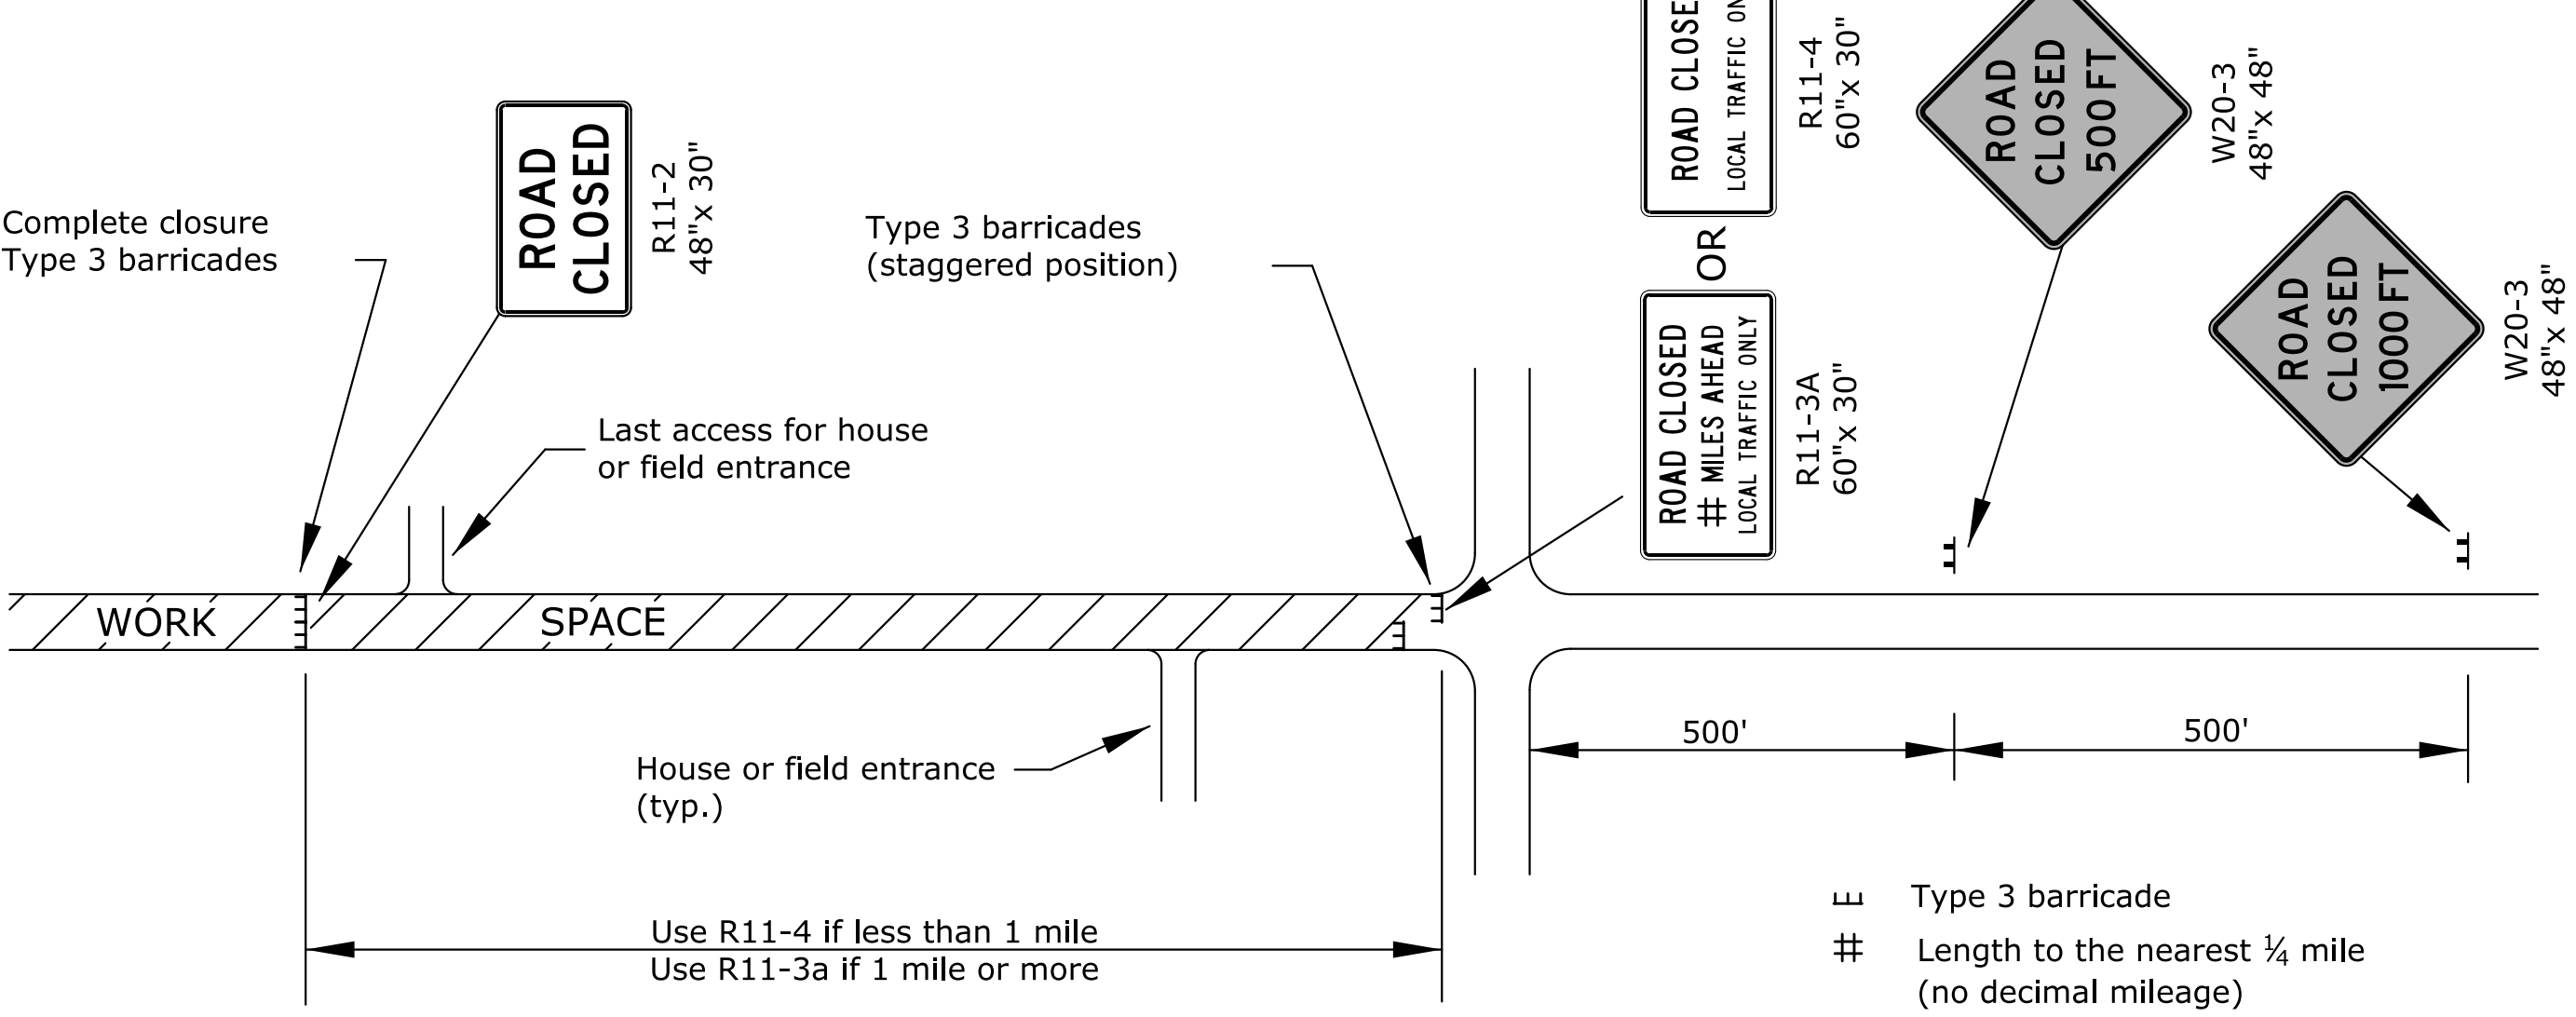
TYPICAL SIGNING FOR ROAD CLOSURE - LOCAL TRAFFIC ACCESS
